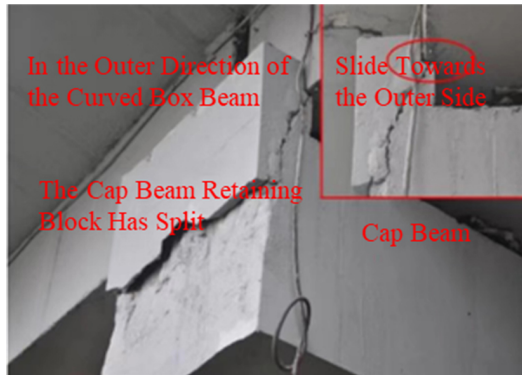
Diagonal splitting of bridge abutment cap beam block
